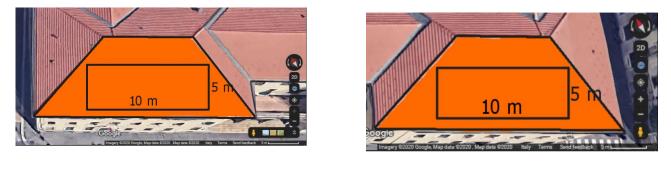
Available rooftop surface for PV plant installation on the two upper roofs of the main entrance building
